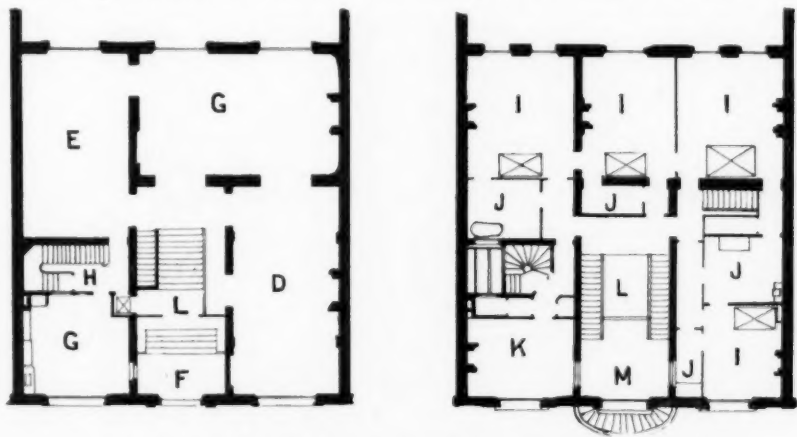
PLANS OF GROUND FLOOR AND SECOND FLOOR.
